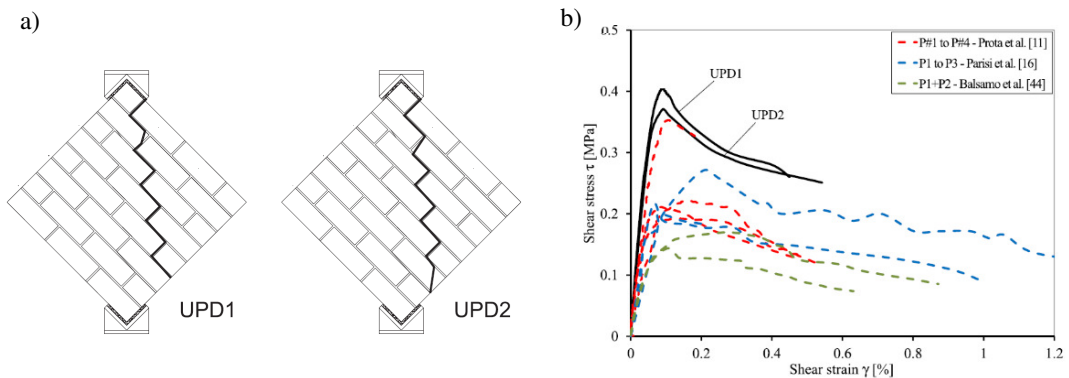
a) Masonry in-plane damage pattern, b) unreinforced masonry in-plane behavior [28]
